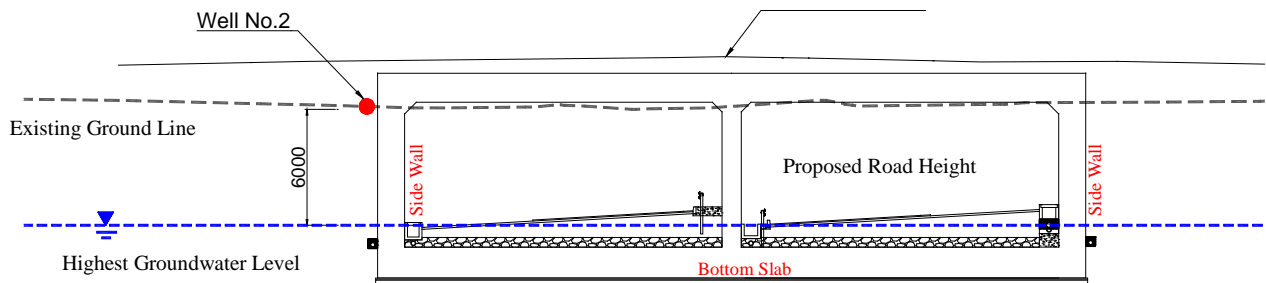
Typical Cross Section of Box Culvert
